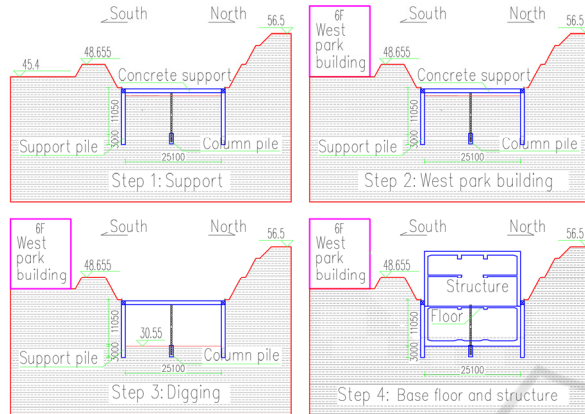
Condition of section 33 of the west parking building and maglev foundation pit of the original construction scheme.
